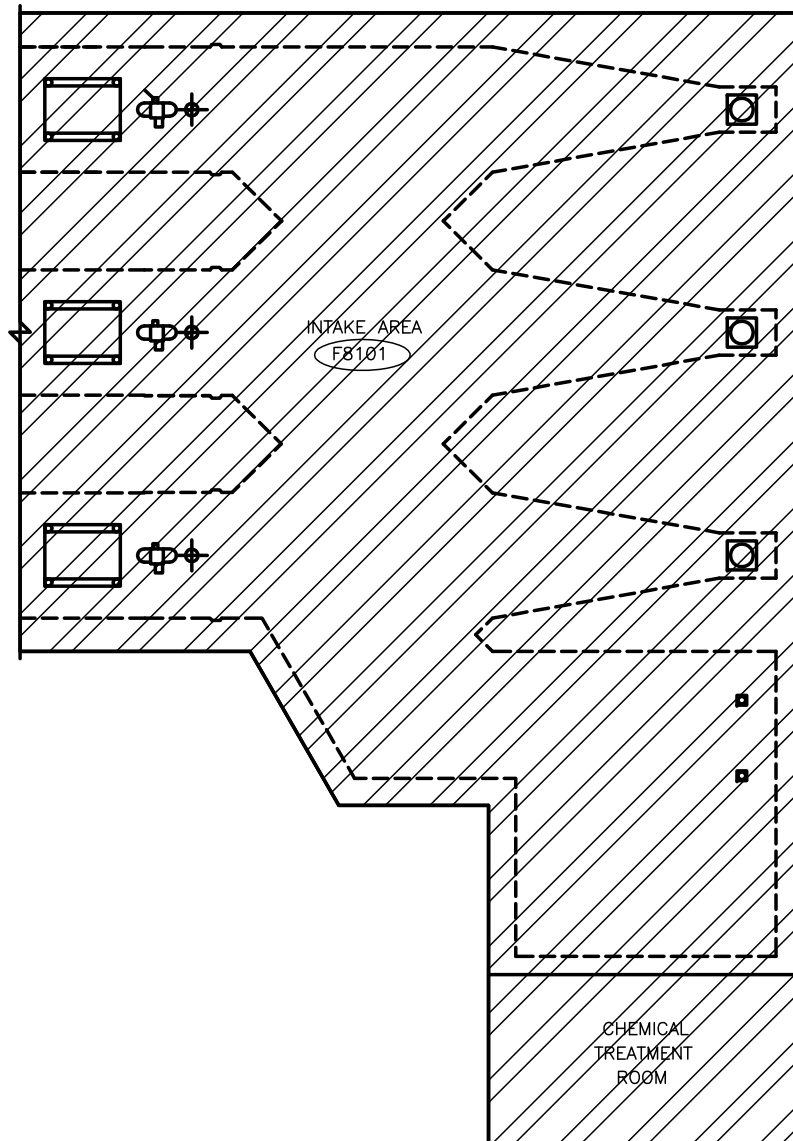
A.2-201 Fire Zones - Station Water Intake Building
